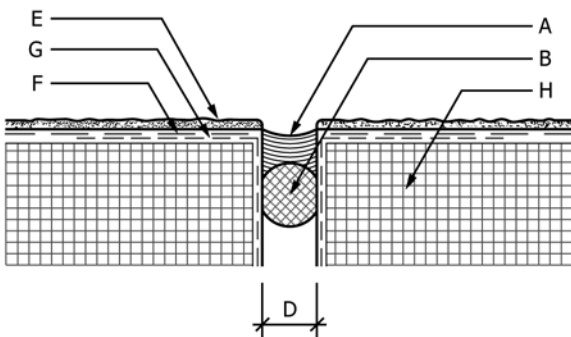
Sealant Butt Joint Seal (EIFS to EIFS)
